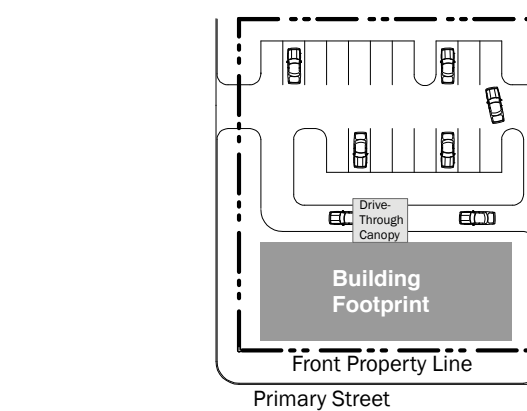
C (1). Recommended drive-through Facility layout.
